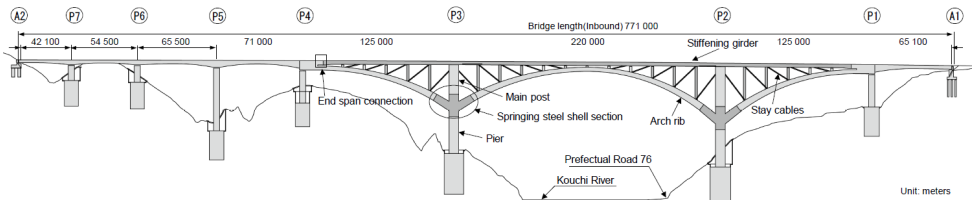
General bridge plan for Kouchigawa bridge (inbound line)
